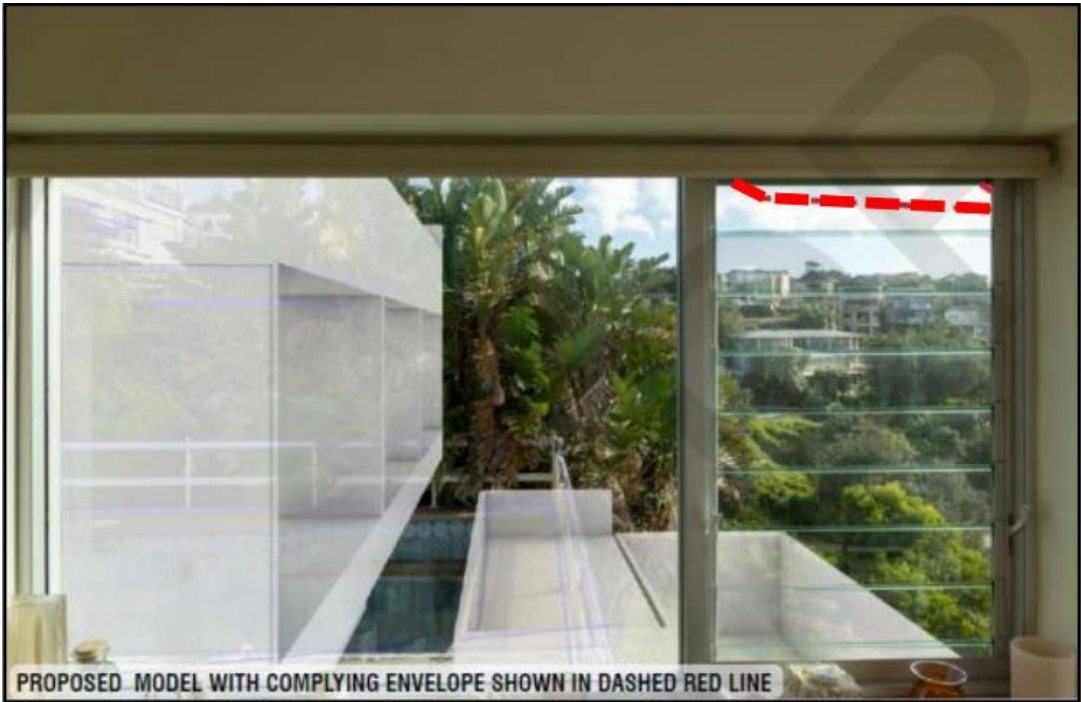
Existing and proposed model (white) view looking from first floor northern side bedroom window of No. 1 Waterside Avenue. Compliant building envelope is shown in red dashed line.
